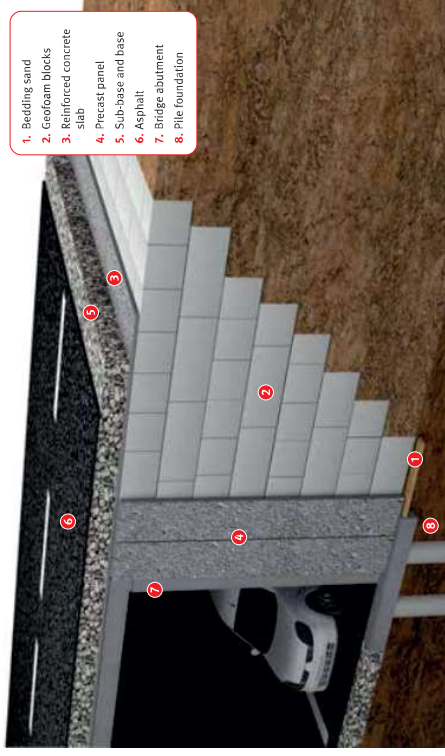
Geofoam block bridge approach embankment: Partial block placement plan
